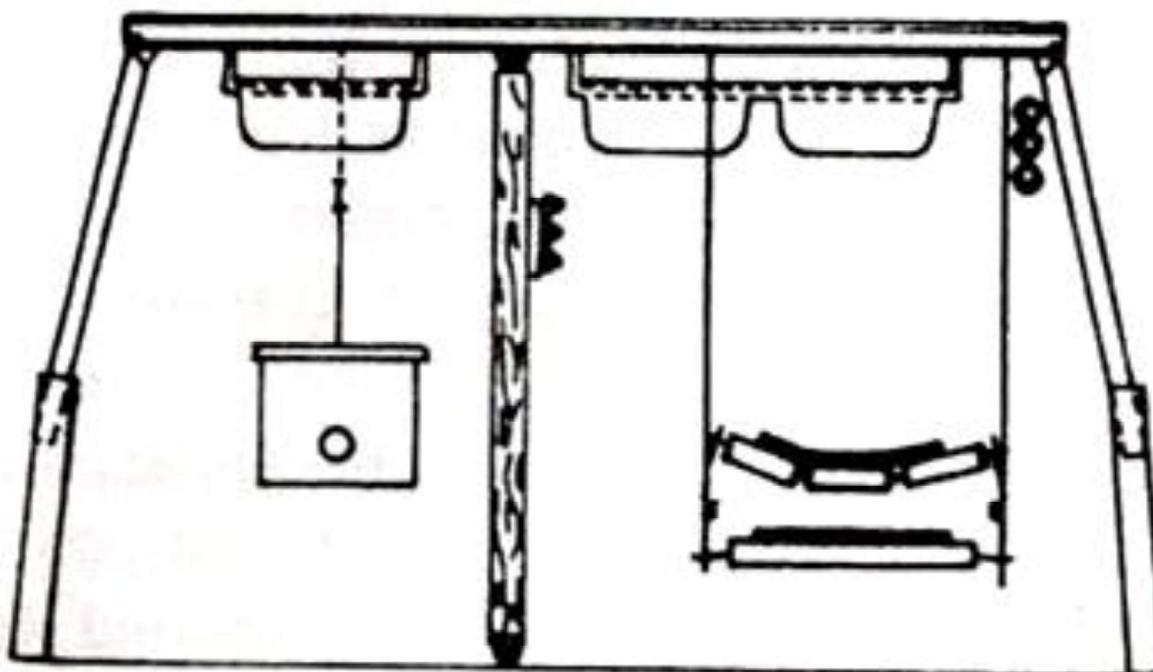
Water troughs in the cross-section of the gate road of an advancing longwall face
